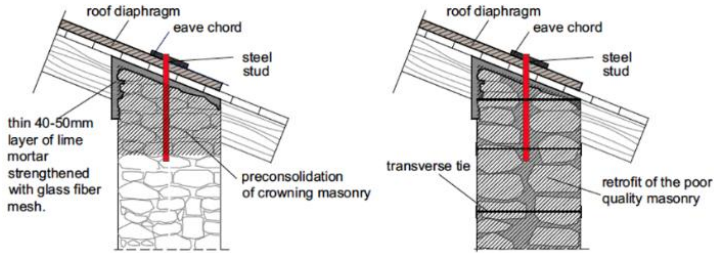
Examples of masonry strengthening and introduction of metal dowels for the connection between masonry and roof diaphragm. From [122]
